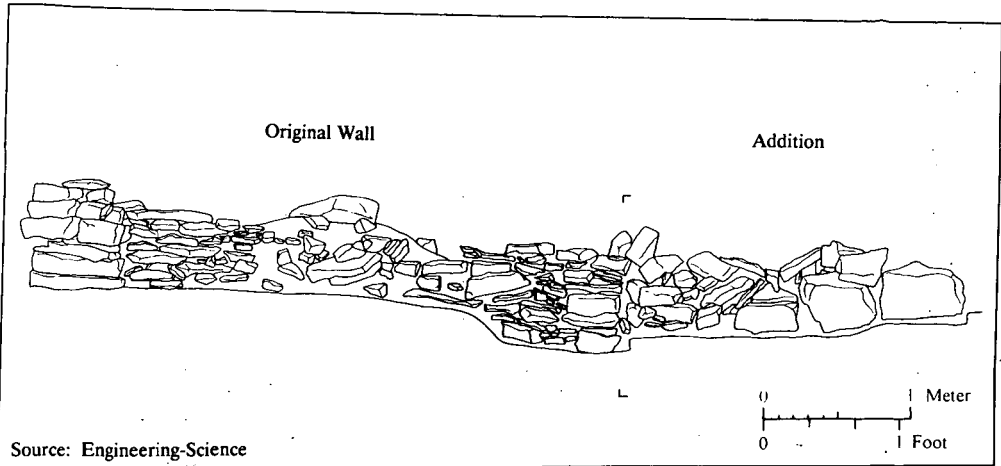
Profile of the west wall of the Shaeffer house (Source: Engineering-Science).
